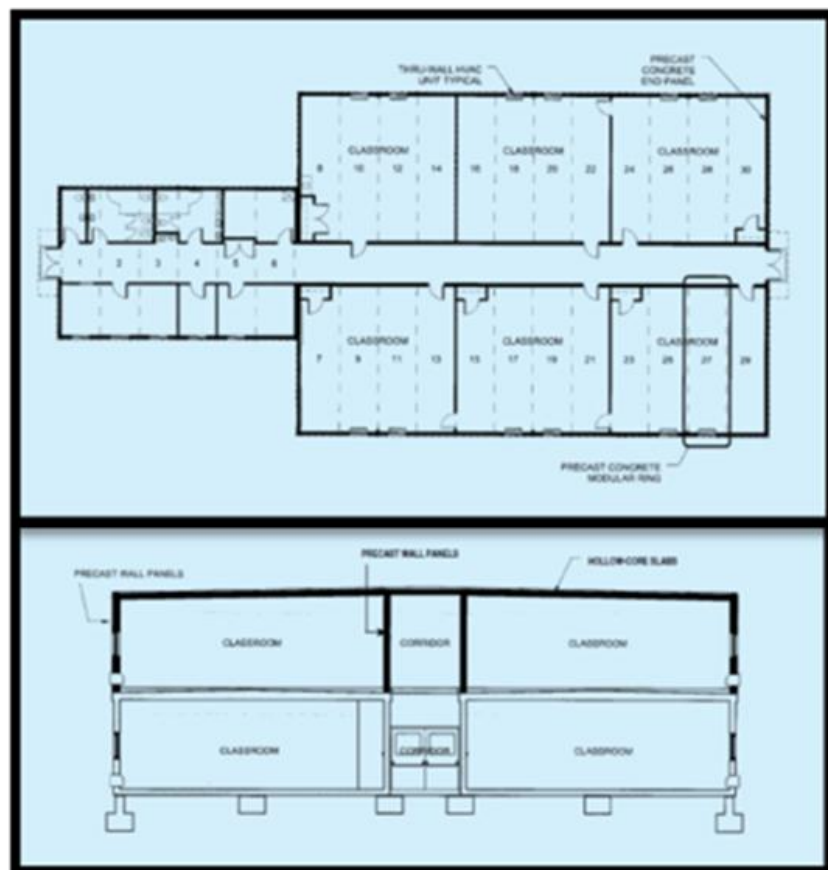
Top: Floor Plan of the first phase (first floor); Bottom: Building section through classroom portion (Smith et al., 2000).
